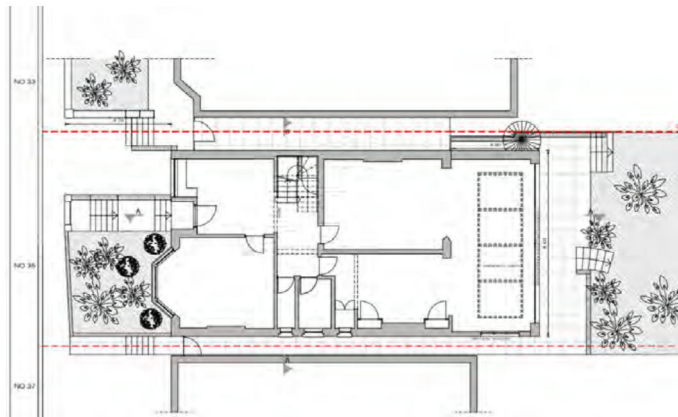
Disposition of 33, 35 and 37 Crediton Hill after construction of 35's extension (source: planning application 2017/2619/P)
